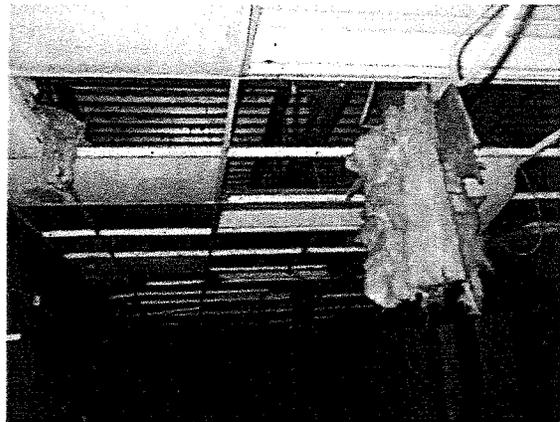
HA 5 (Building C) – 2'x4' ceiling tile
